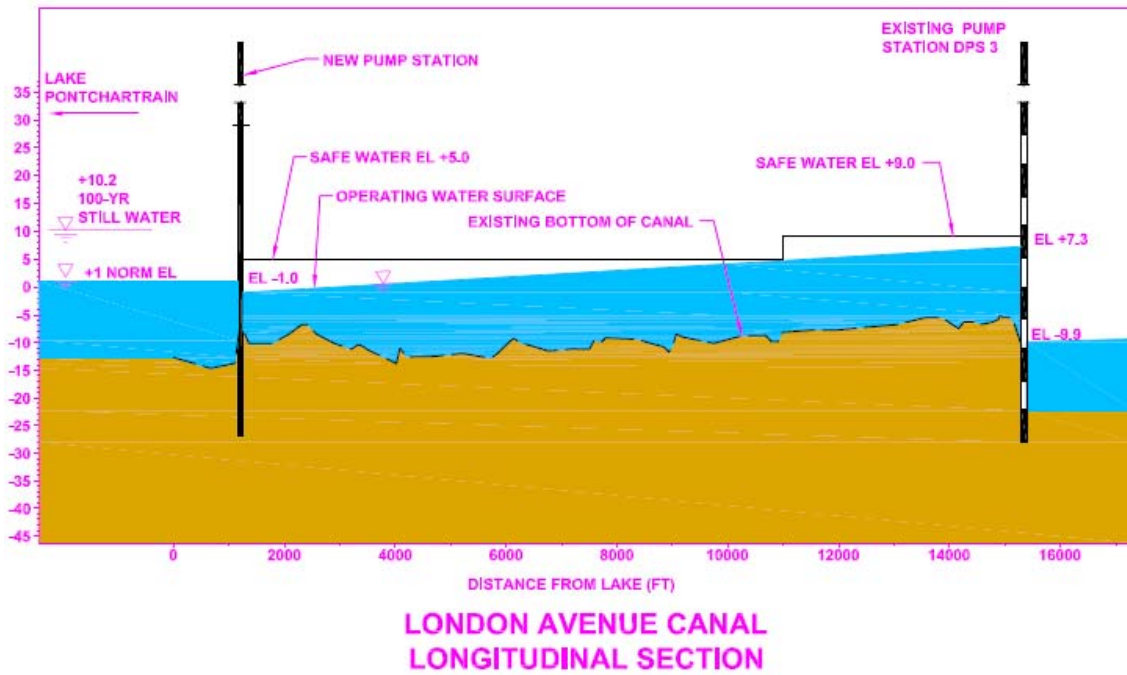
London Avenue Canal Longitudinal Profile for Option 1
